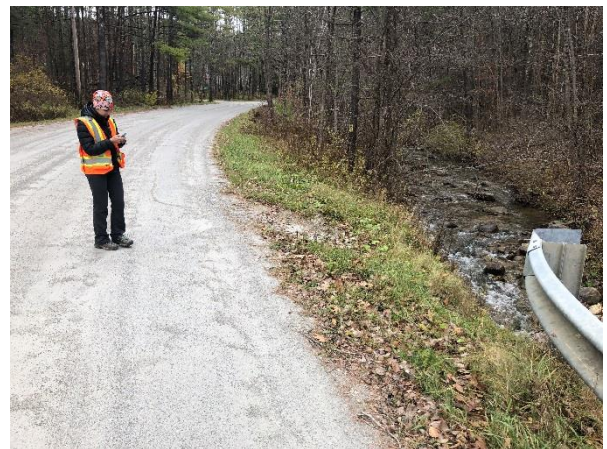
Runoff on the south side of the road drains via a poor conveyance directly into Paran Creek.
